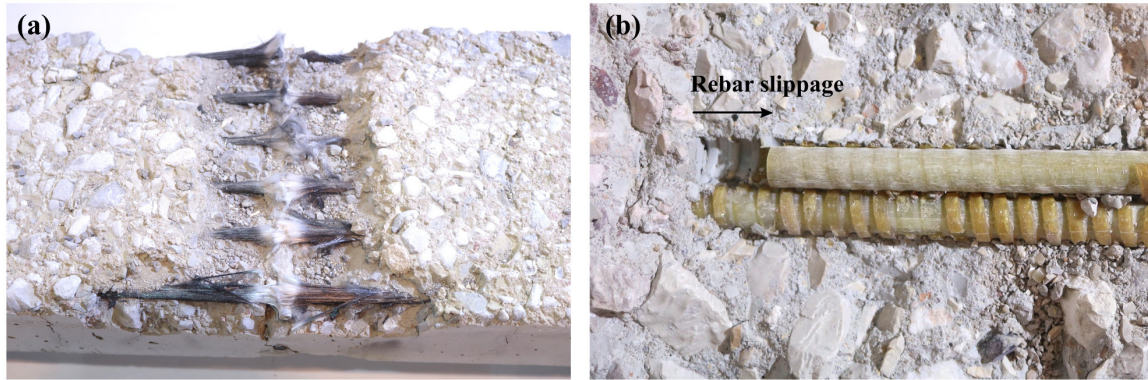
Typical failure modes of GFRP-RC slabs exposed to fire: (a) rebar tensile failure in slabs with continuous reinforcement (slab RB-C2.5-D8) and (b) rebar slippage in lap splices (slab RBP-LS65(S)-D12).
